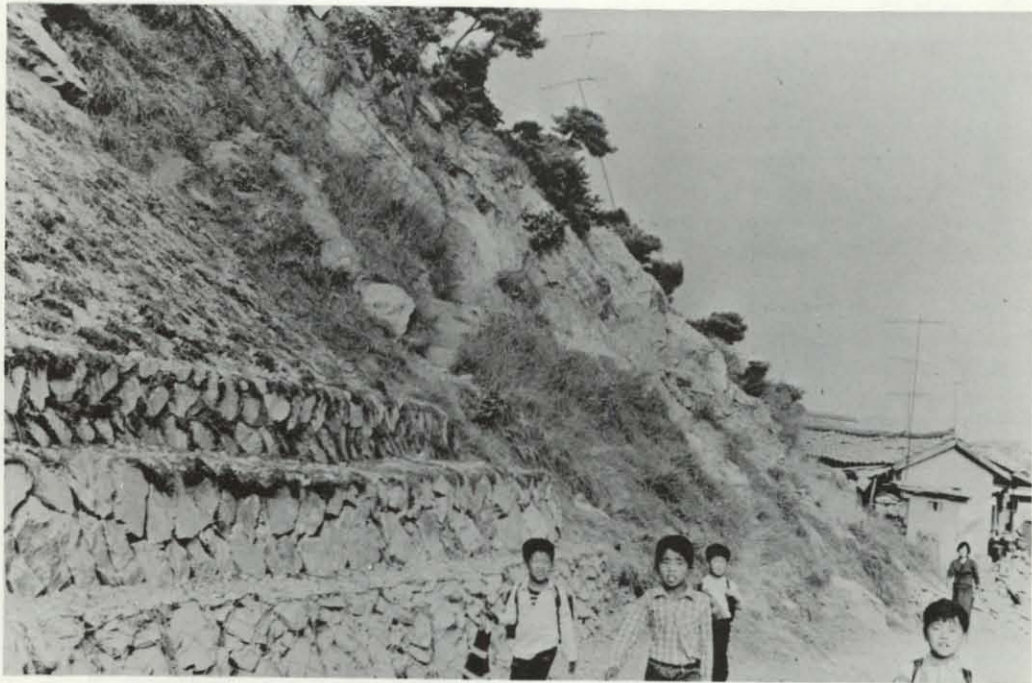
Children returning home from school pass stone buttressed terraces stabilizing a slope in the Suam-Cheon drainage.
